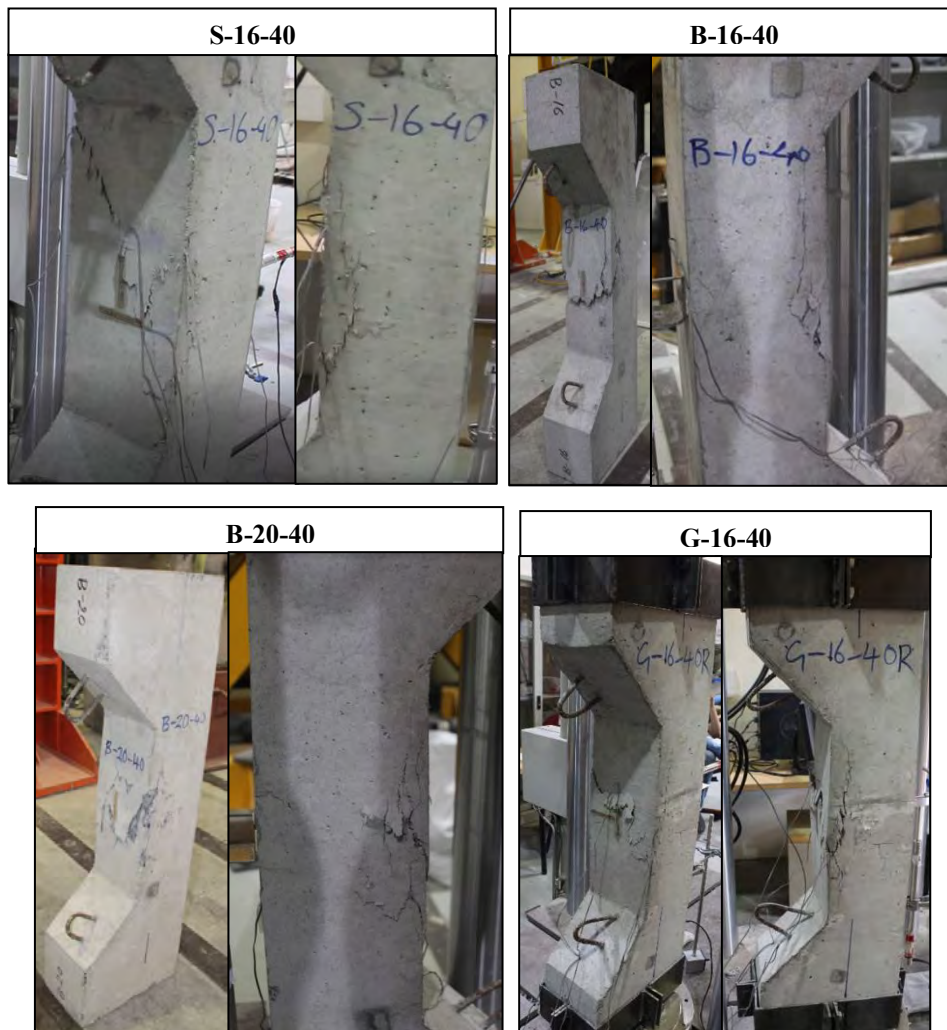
Photos of Group 1 column specimens tested under 40 mm eccentricity, after failure
